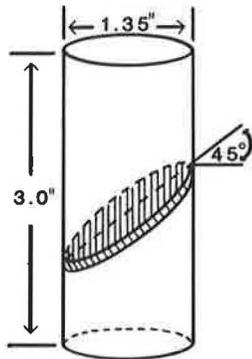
Angle split-seam-stabilized compression specimen, shear reinforcement.
